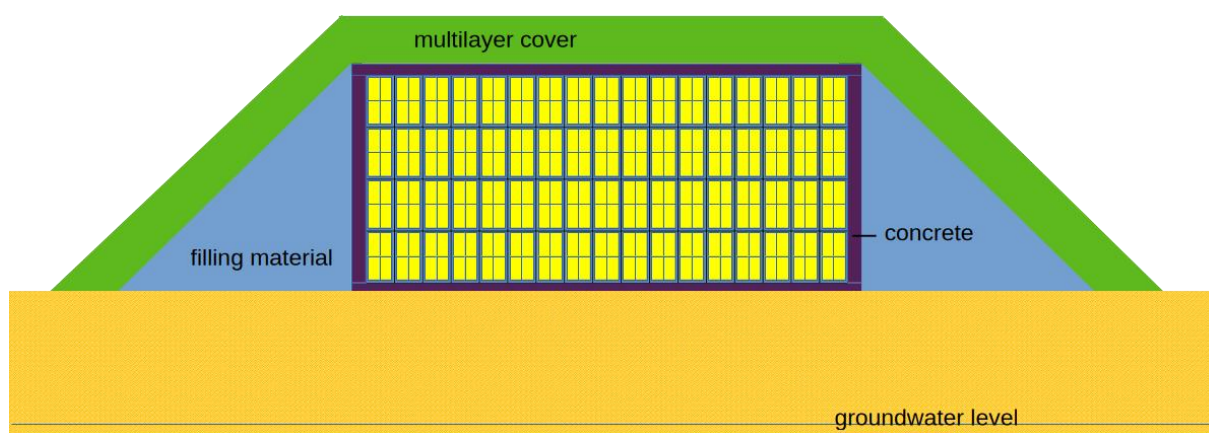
Generic near-surface disposal system. Details on multi-layer cover and concrete barriers are defined in this document.
